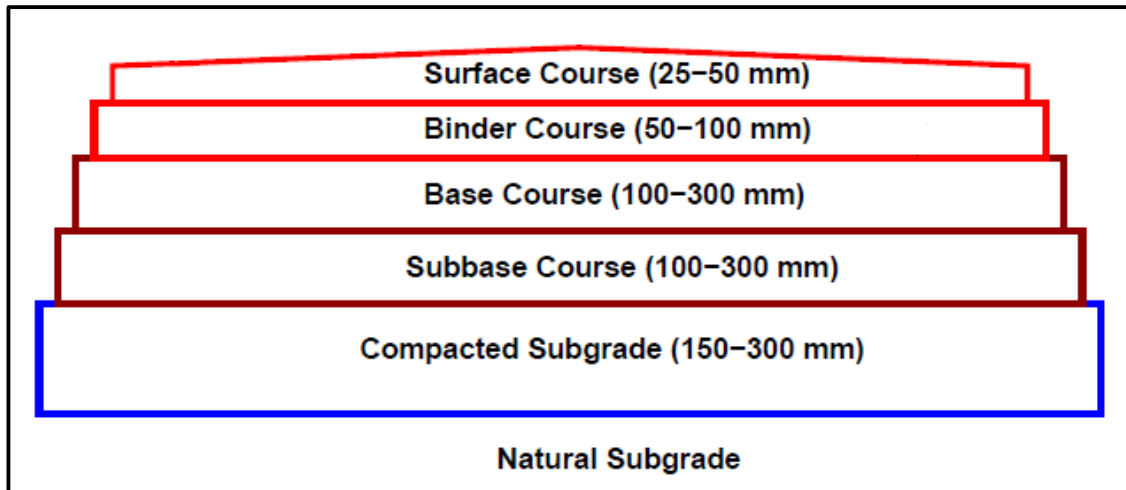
Typical cross section of a flexible pavement (Suryakanta, 2015)
